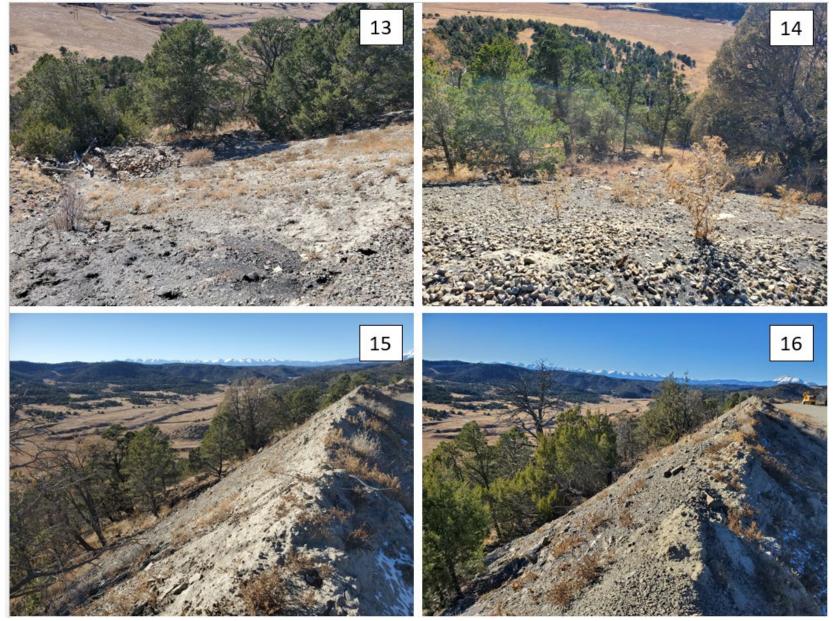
Photos 13 and 14 are looking downslope, and Photos 15 and 16 are looking across, the MSHA berms in the south-west portion of the permit. Sliding has occurred downslope of these berms.
